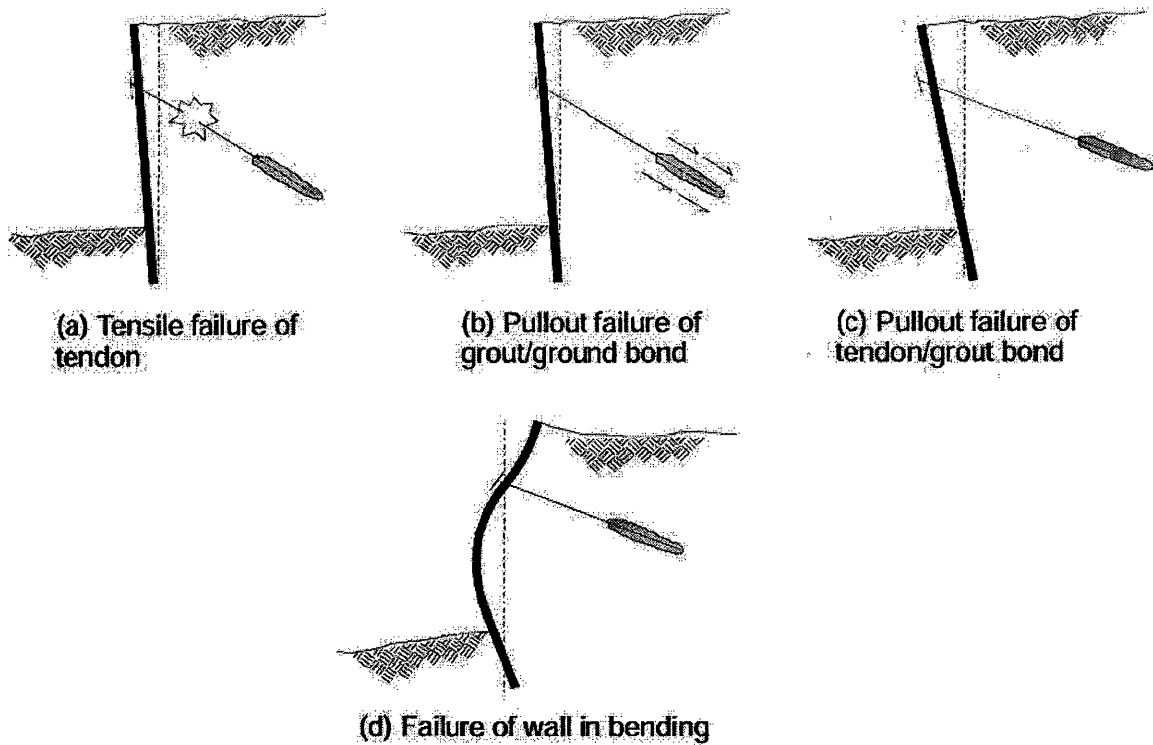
Examples of failure types for earth anchored retaining walls (Sabatini et al., 1999)
